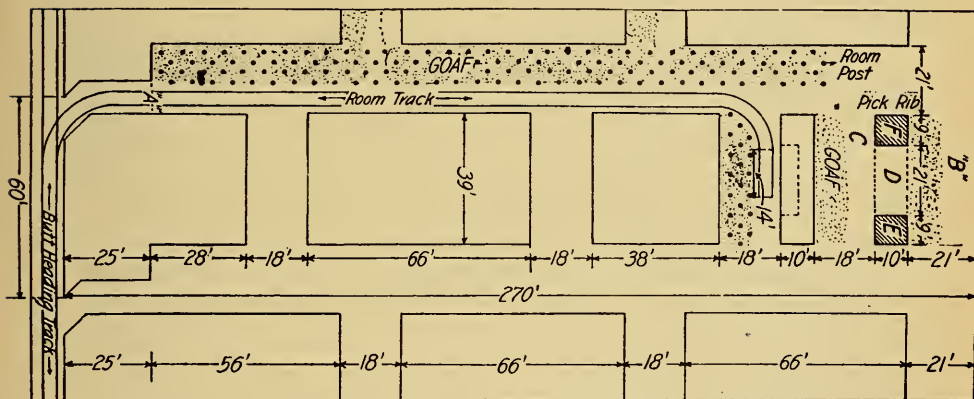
DETAIL OF PILLAR WORK UNDER DRAW SLATE
